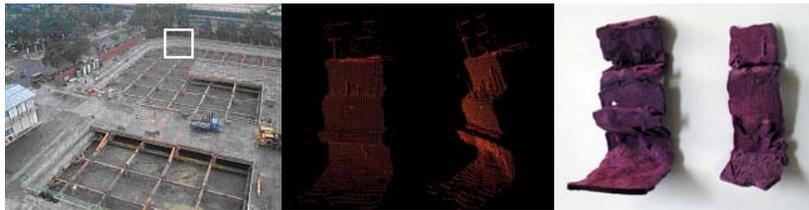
Photo, point cloud, and RP output (from left to right) of retaining wall section
